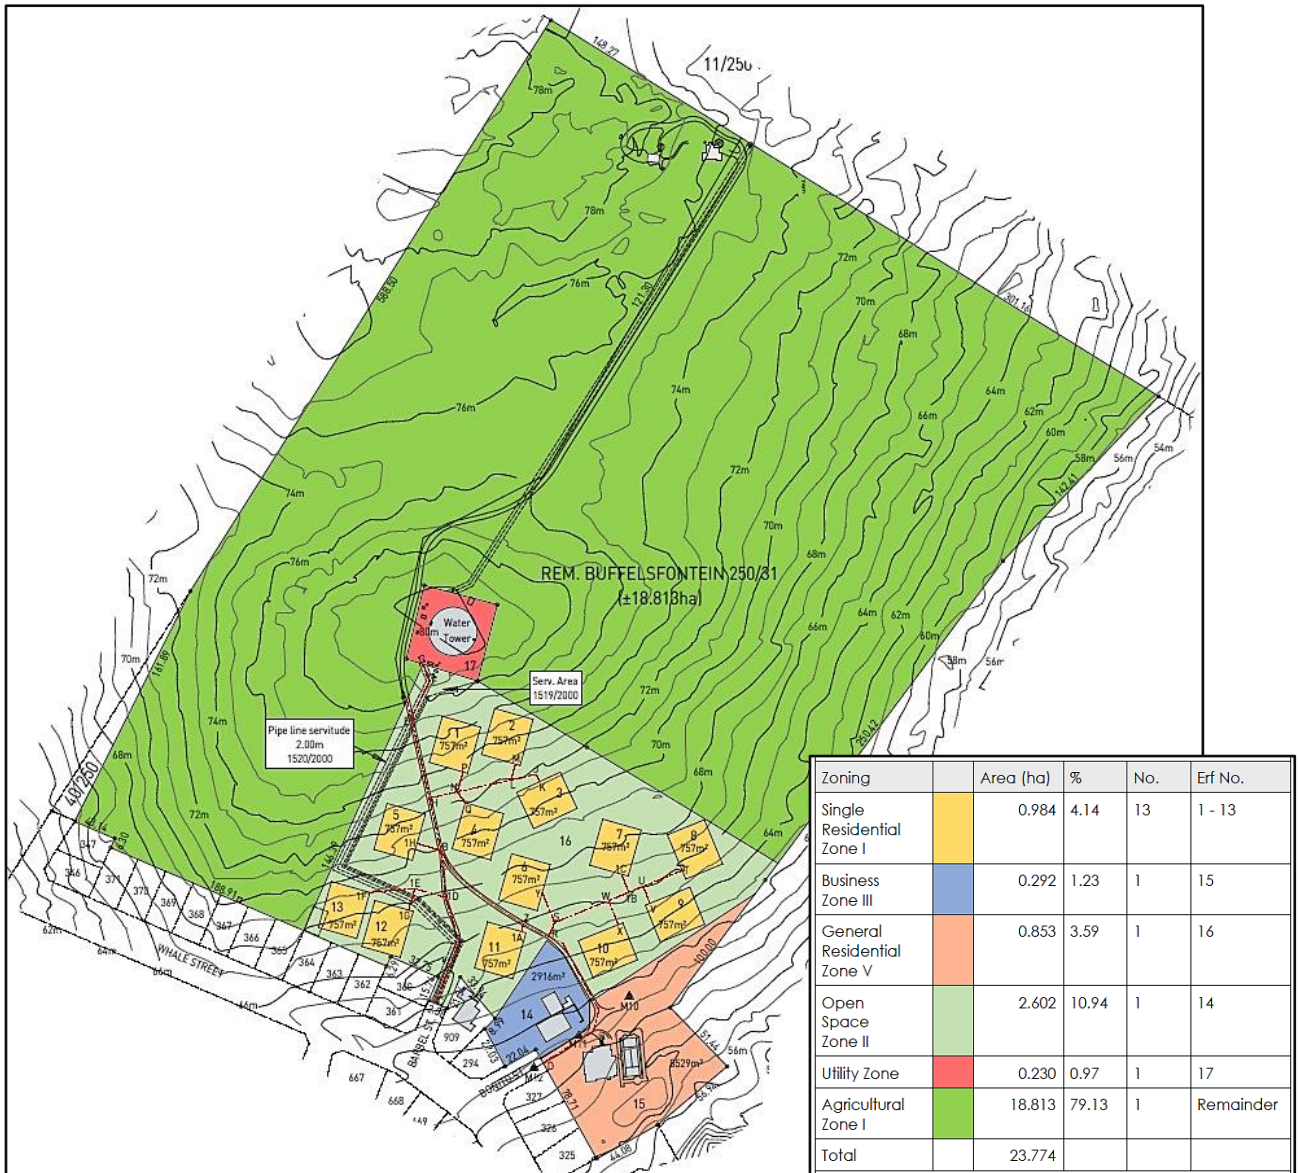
Preferred Site Development Plan (Version 1) (Source: Marlize de Bruyn Planning).
